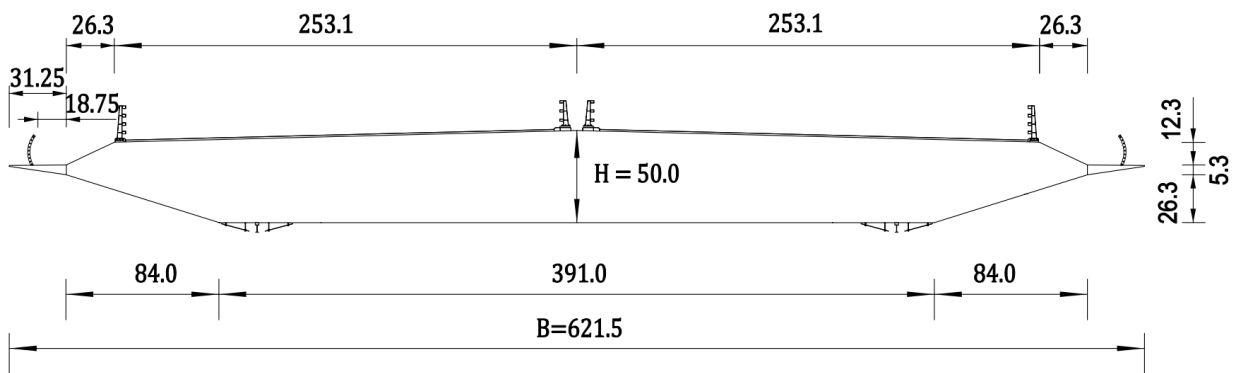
Cross-section of the sectional model (Unit: mm)
